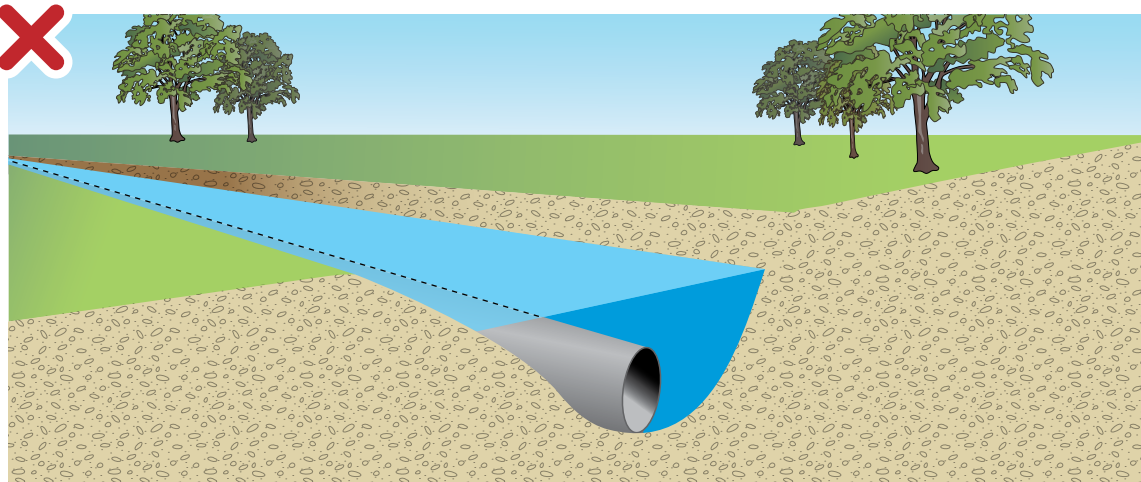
Poor practice, do not lay pipes or cables on the river bed or use rivers as conduits for pipes and cables.
